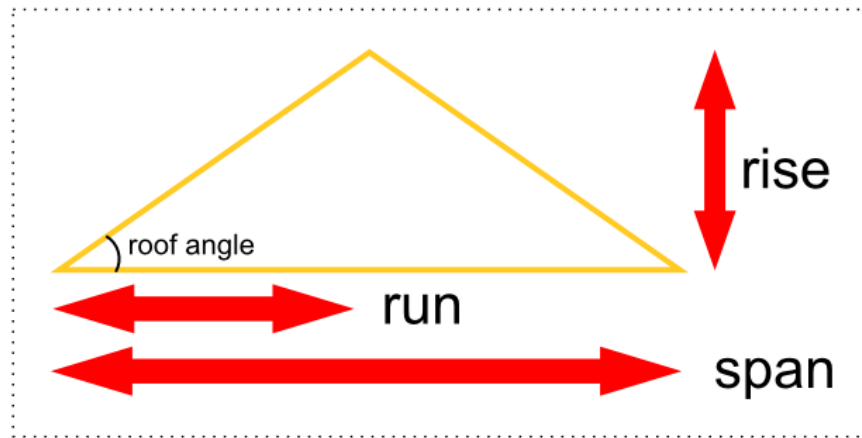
Sketch of typical pitched roof and definition of its run, rise and span.
